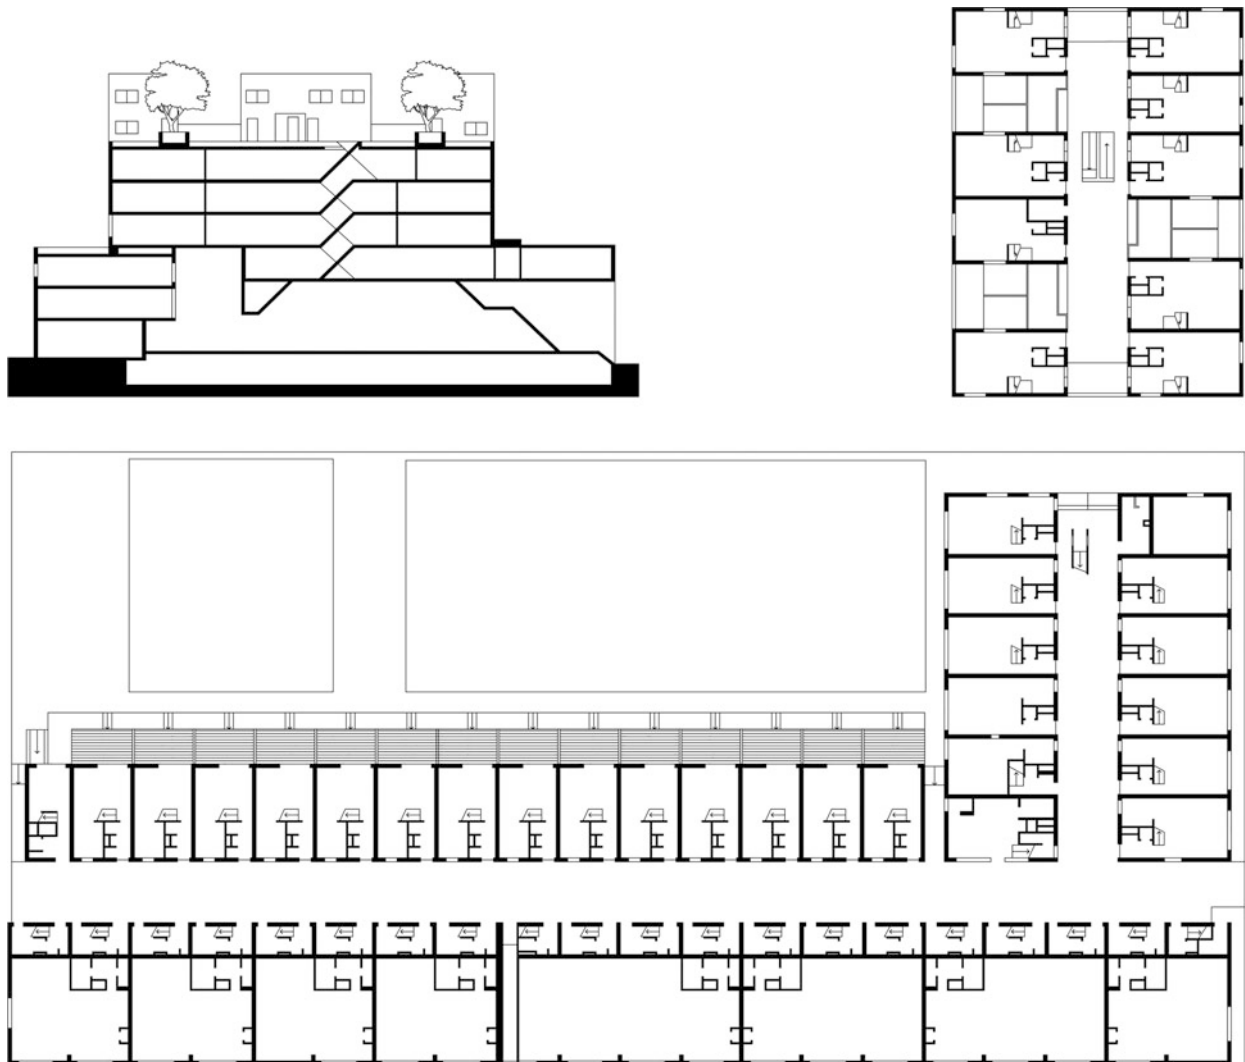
Dick van Gameren. Ijburg, Amsterdam. Plan and section of the urban block
